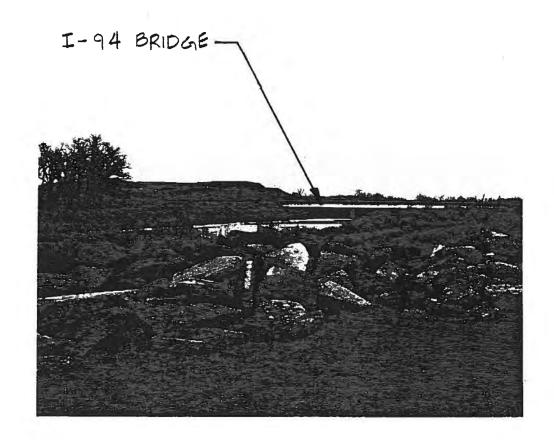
UNAPPROVED BROKEN CONCRETE FILL - TONGUE RIVER INTAKE CHANNEL CONTROL SITES
